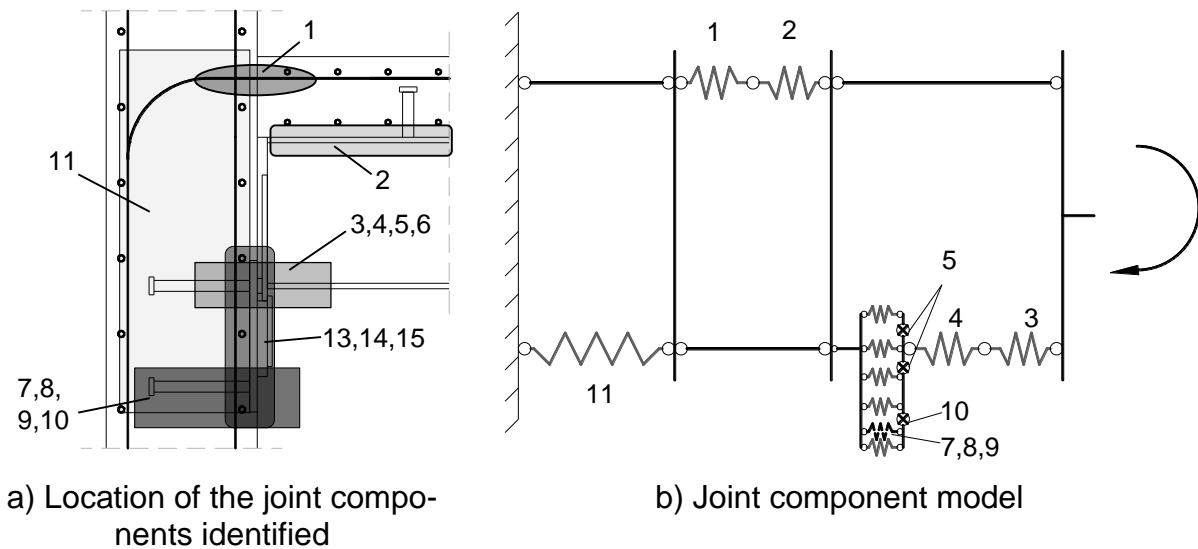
Application of the component method to a composite beam to reinforced concrete wall joint subject to hogging bending moment
